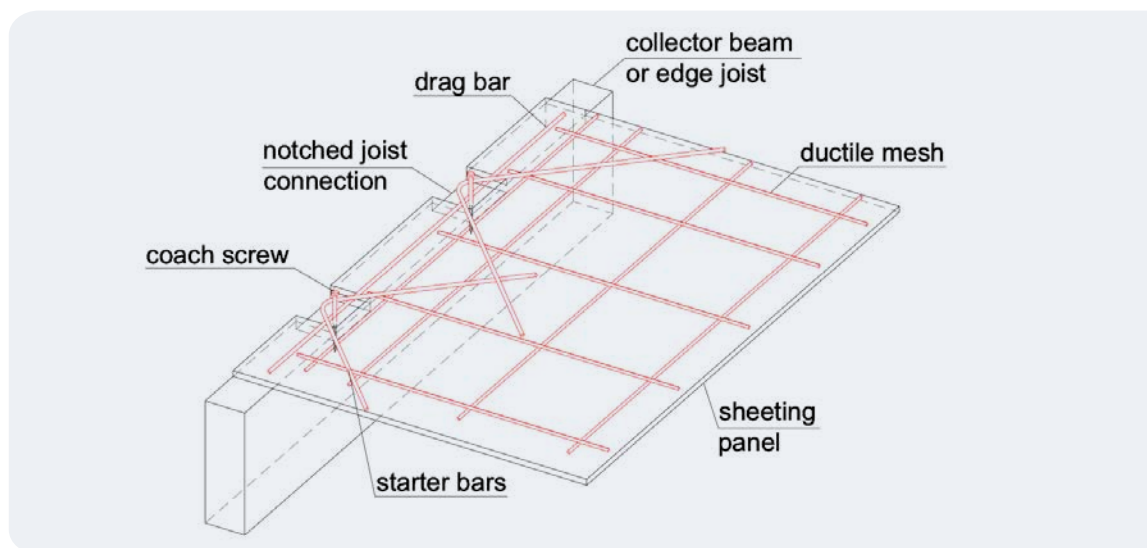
Suggested connection between the concrete topping and timber beams.
